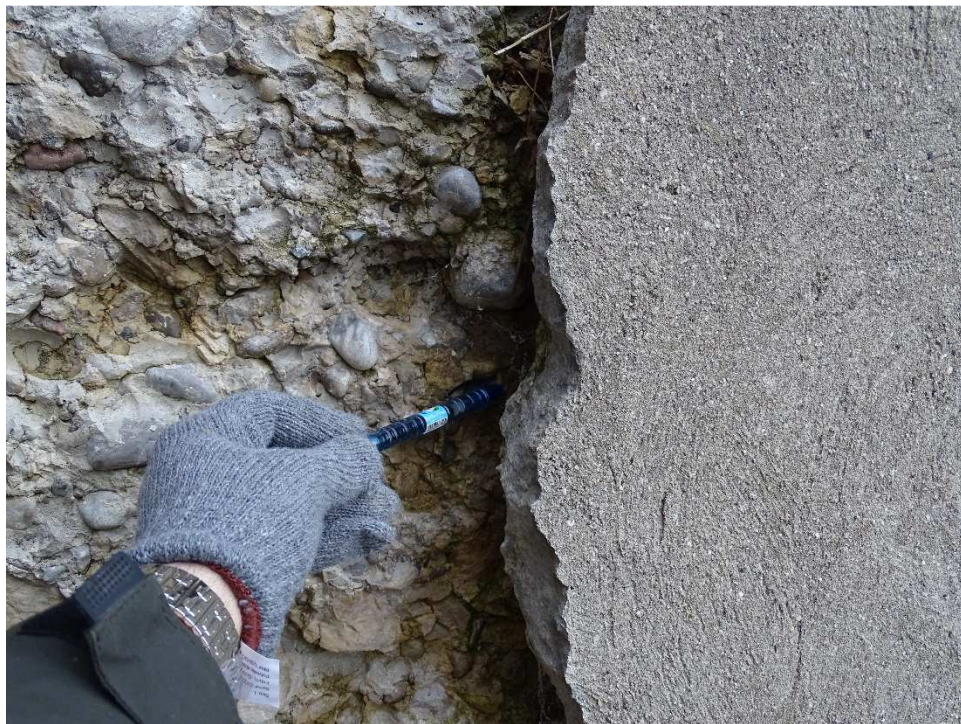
North Downstream Retaining Wall – Severe Spalling
